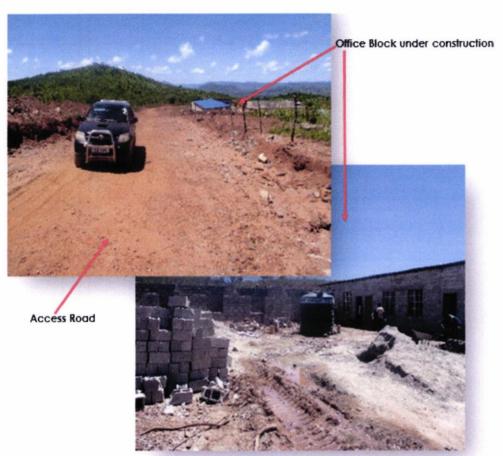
(2): Showing the constructed Access Road and Office block under construction.
